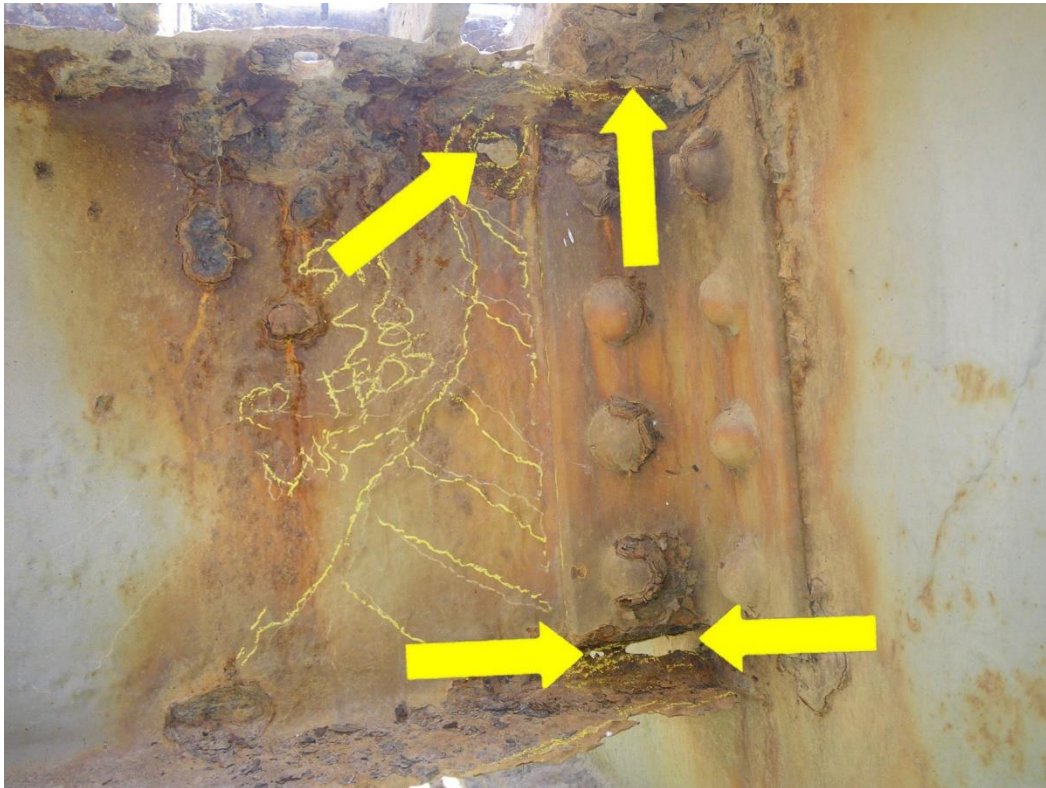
Stringer S8 at North Side of Floorbeam FB0S, West Face, Span 1 - Section loss of flanges and web including areas of 100% section loss. Note failed paint system.
